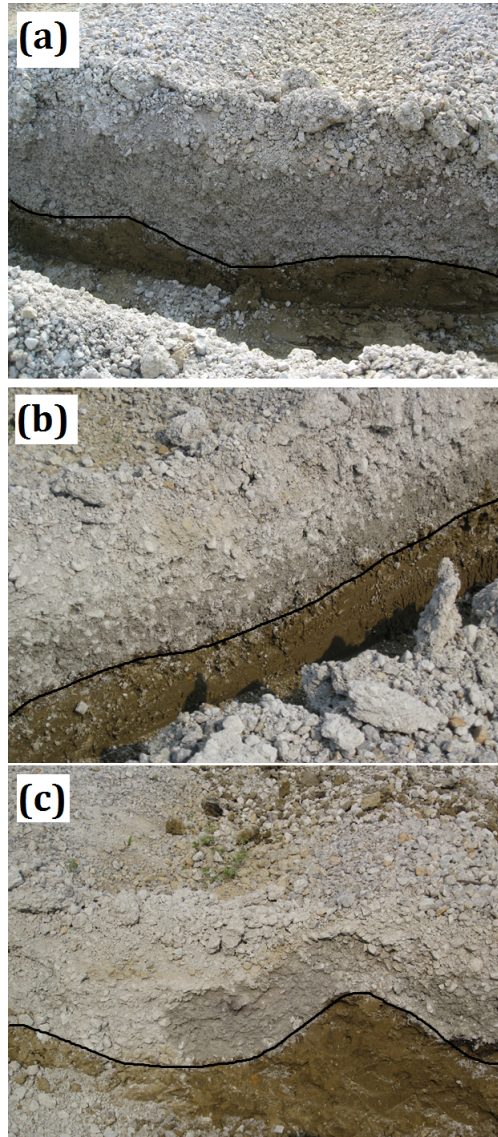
Excavated Trench Photos Showing Surface and Base-Subgrade Interface Deformations in Test Sections (a) 1, (b) 2, and (c) 3 due to Loading under Flooded Conditions
